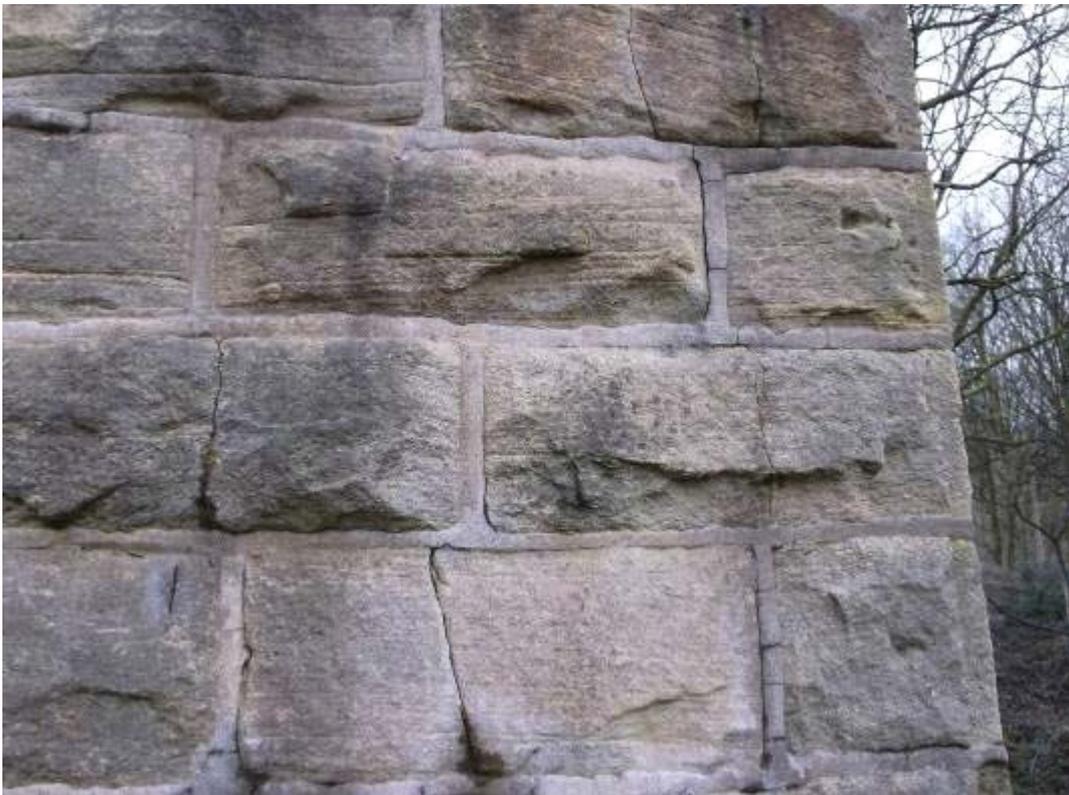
Missing block & vertical fracture to south west elevation of pier 8
